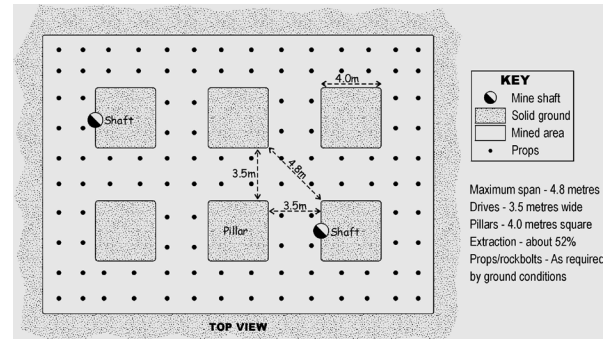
Example of room and pillar mining, 4.8 metres maximum span.
